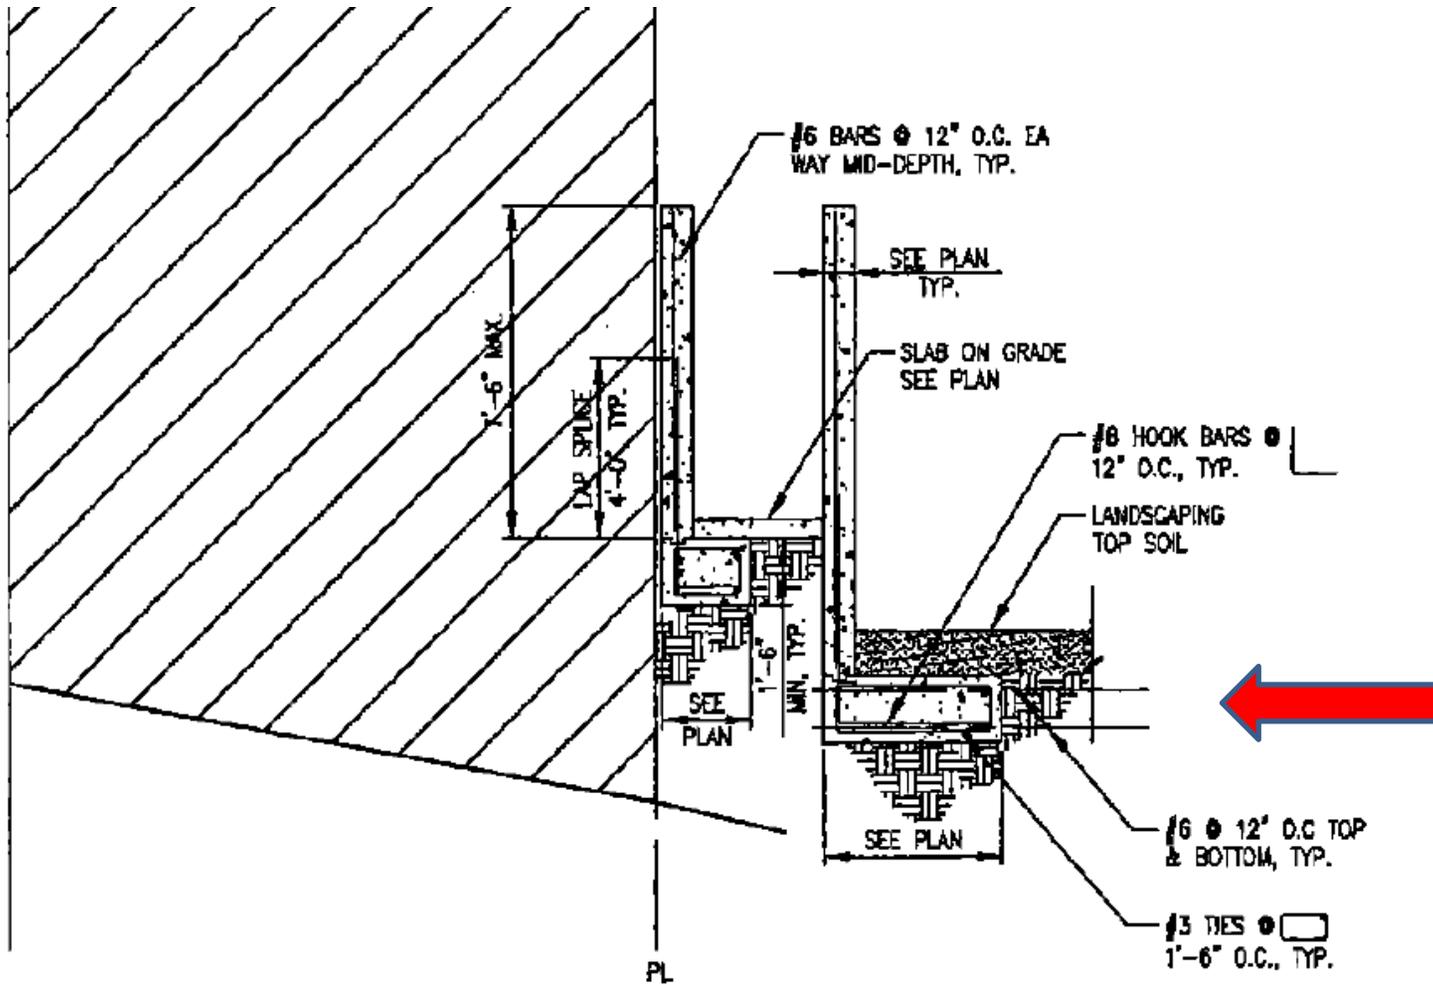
Detail 3 on Sheet S4.1 of Building Permit Application No. 201705116316
